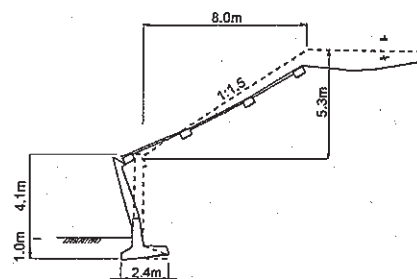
Rupture of the facing of cantilever RC RW; embankment of JR Shin-Nagoya Station
